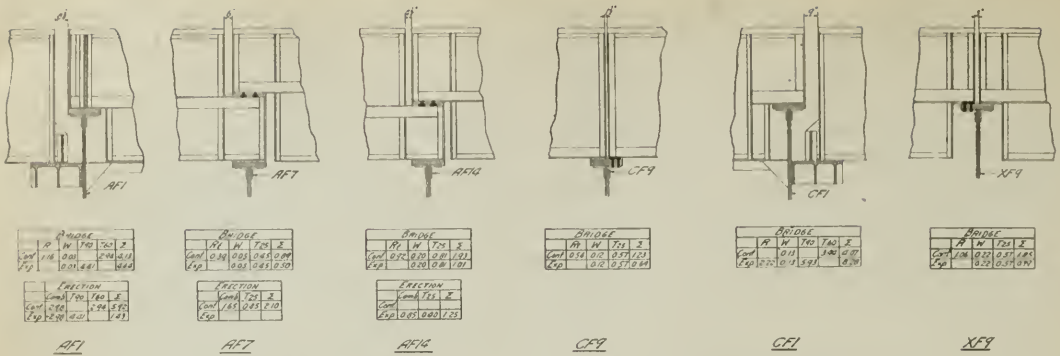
Expansion Joints for Track Girders at Main and Intermediate Panel Points
